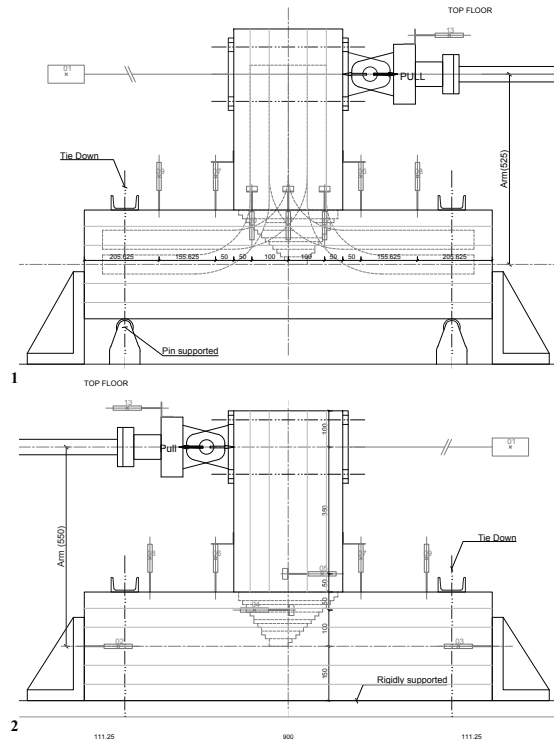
Column-beam assemblies test setups. 1. Front side of the pin-supported full connection, and 2. Back sided of the rigidly supported column-beam assembly. Both setups share the same placement of transducers (1~13) (units in mm)
